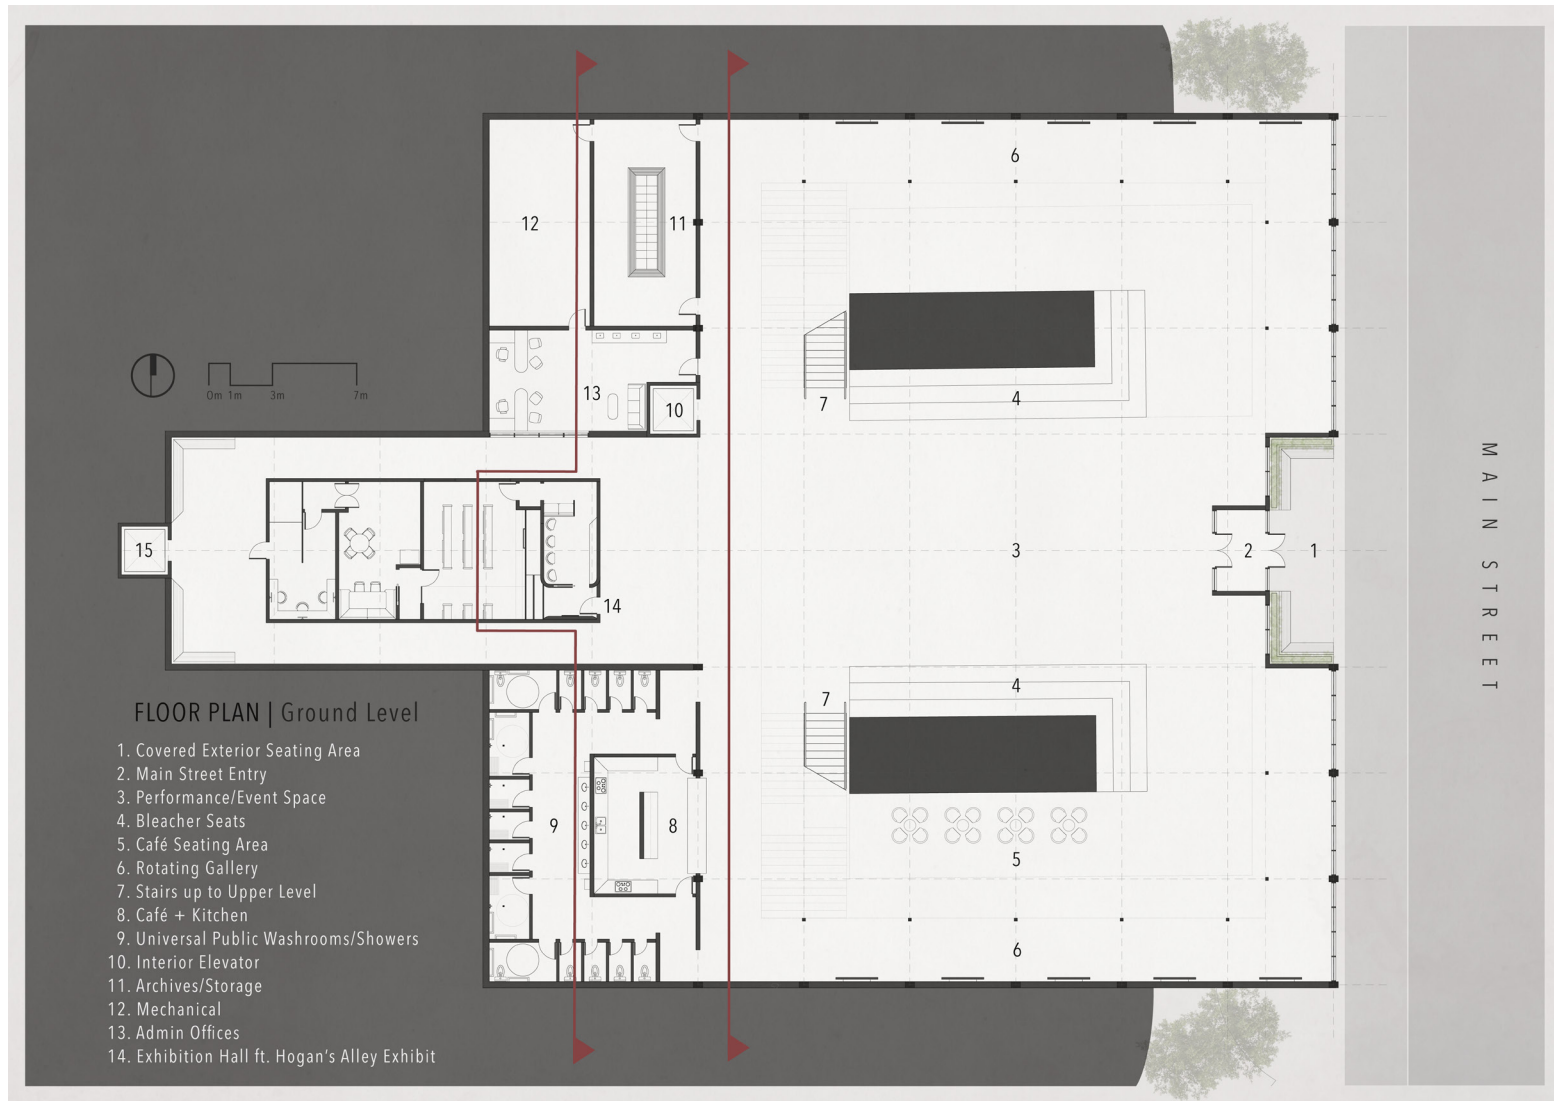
Floor Plan for Node 4: Hogan's Alley Community Centre & Gallery. Ground/Street Level.
